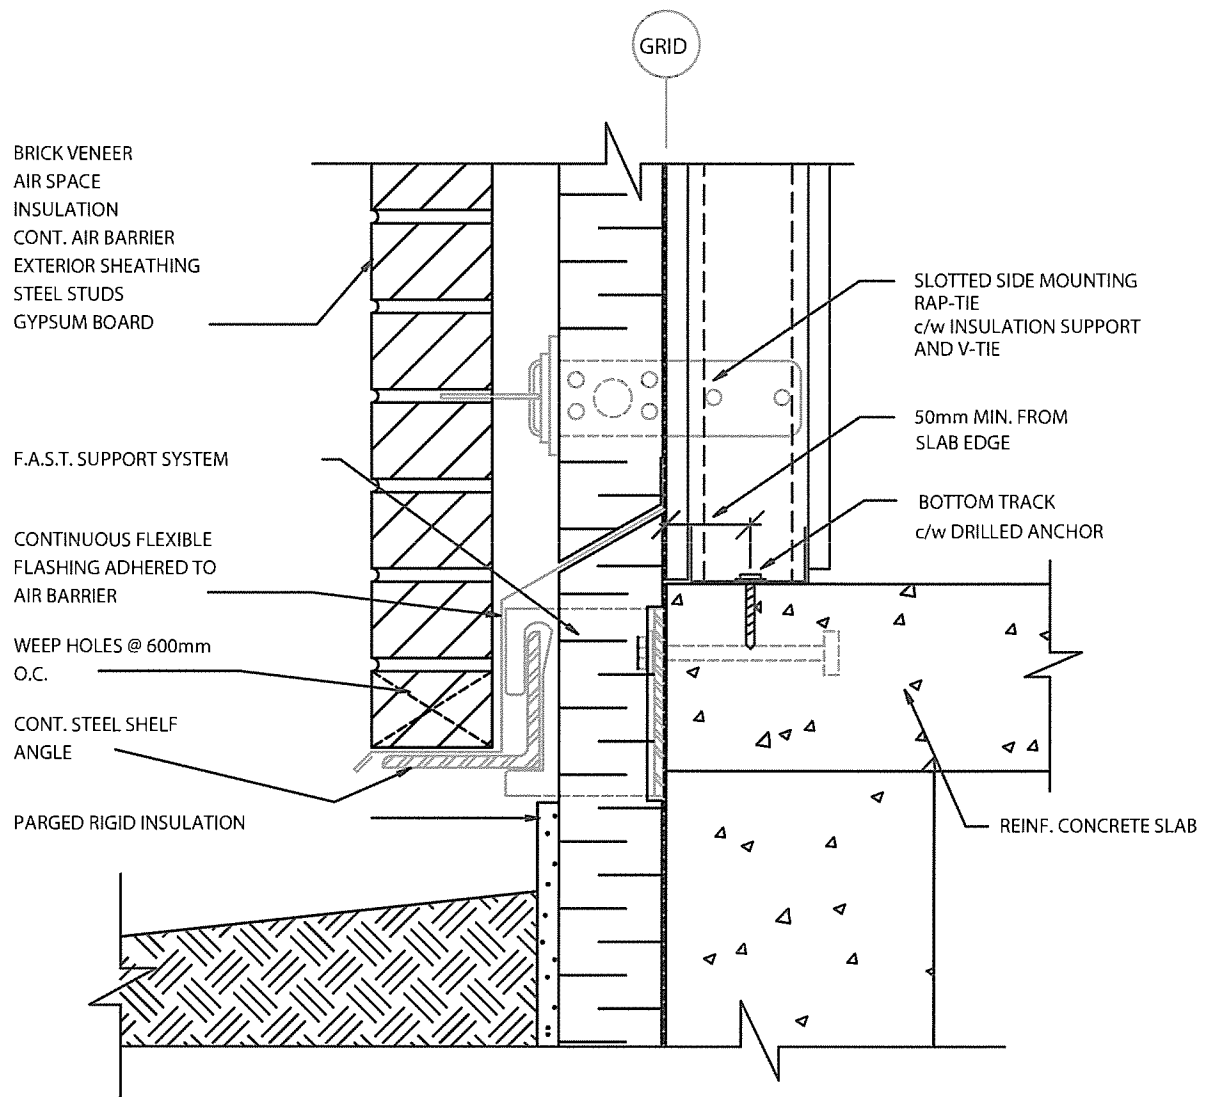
BRICK VENEER / STEEL STUD DETAIL AT FOUNDATION
